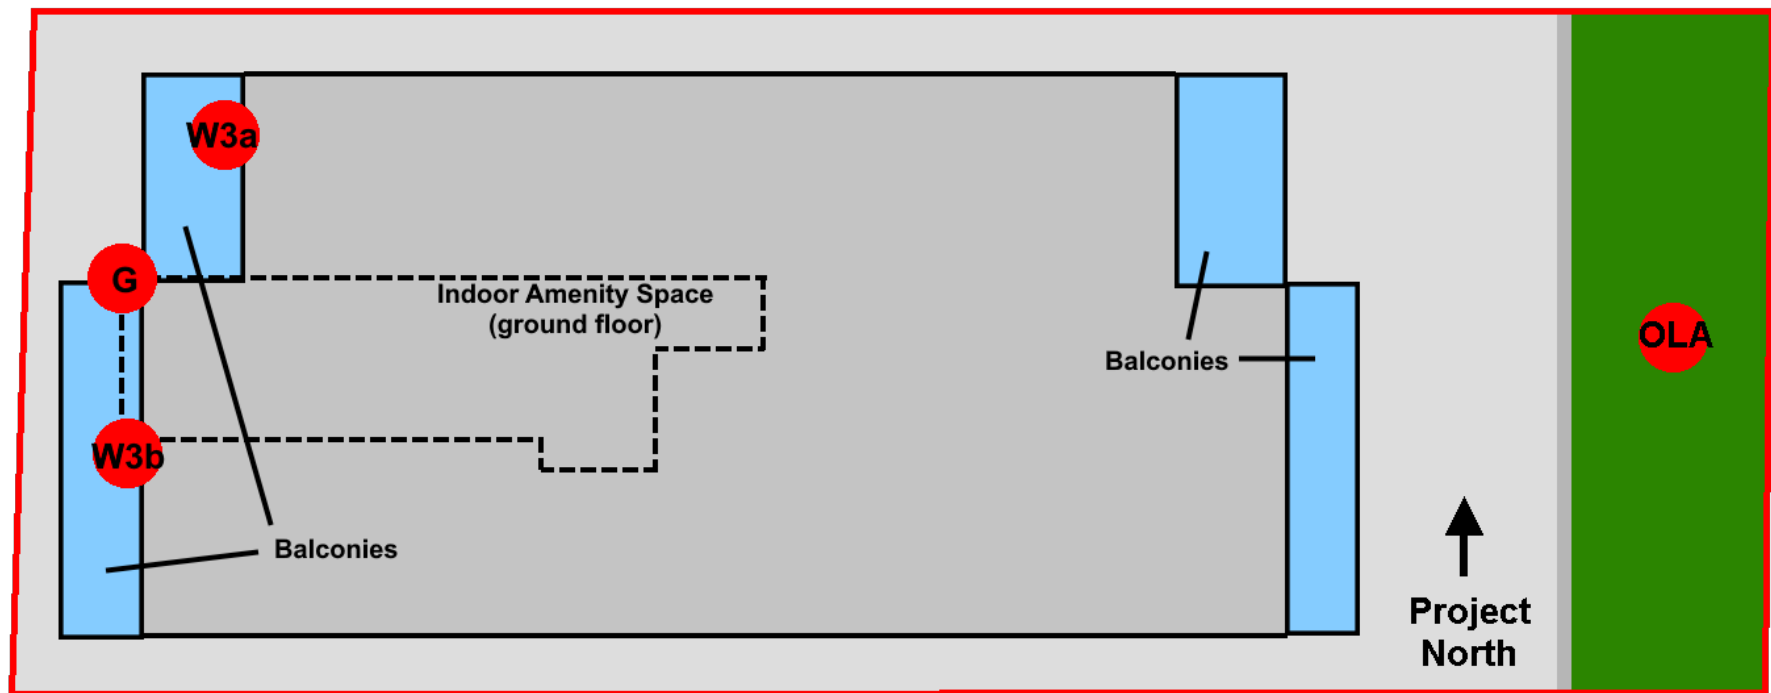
POA Locations – OLA, Ground Floor and Level 3
